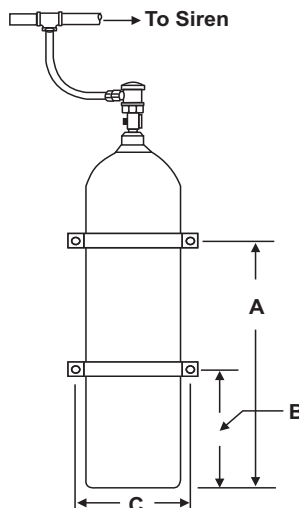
Typical 1040 cu. in. Nitrogen Pilot Cylinder Strap Installation
